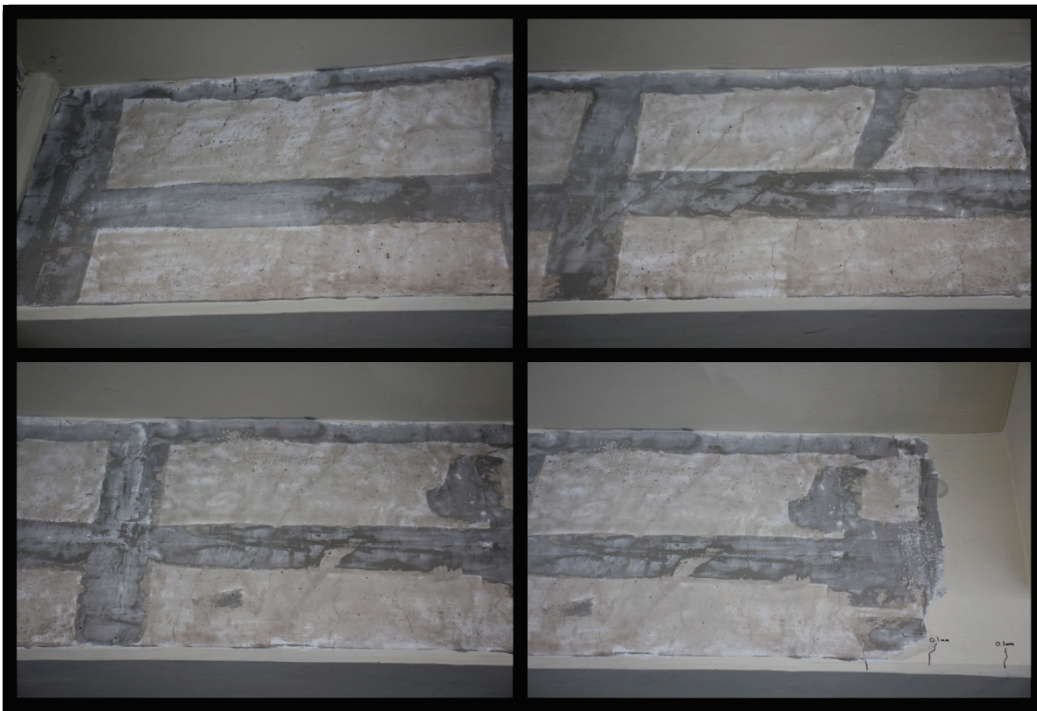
Mapped cracks in bare concrete of beam along column line 4 in Parking Garage 1.
